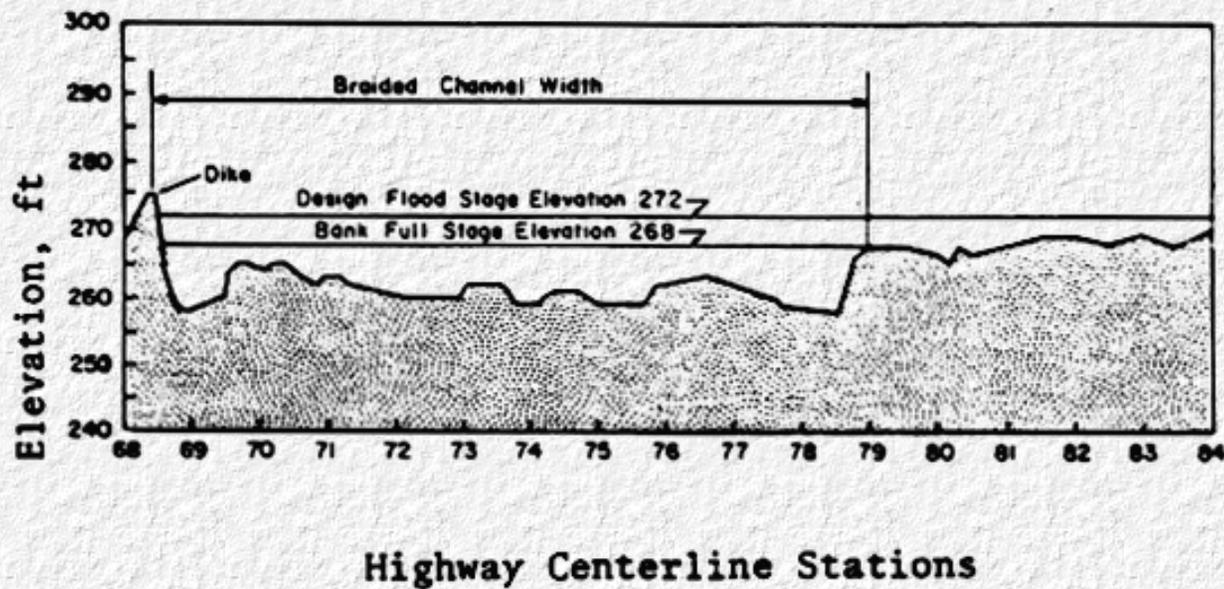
Cross Section of the Crossing on Mainstream River
